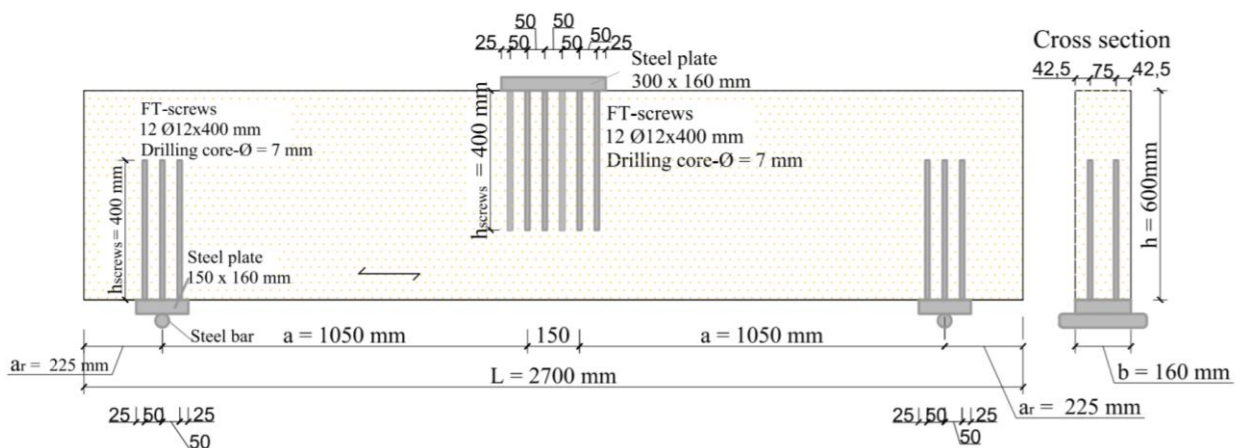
Outline and dimensions of the test specimens of series A [28] (adapted)
